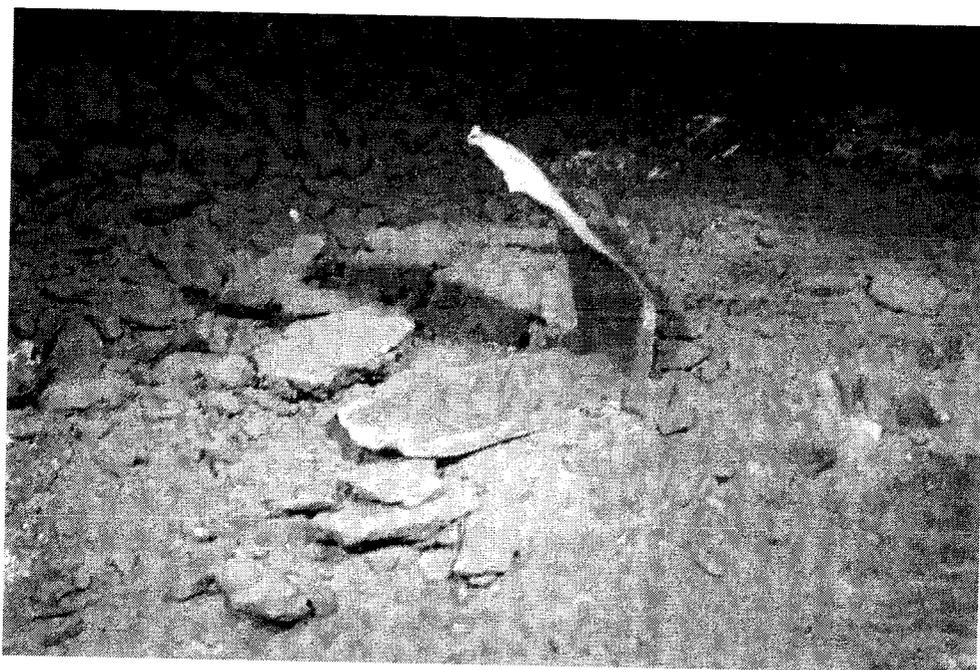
Inby segment of roof strap at A Left No. 3 Seal
